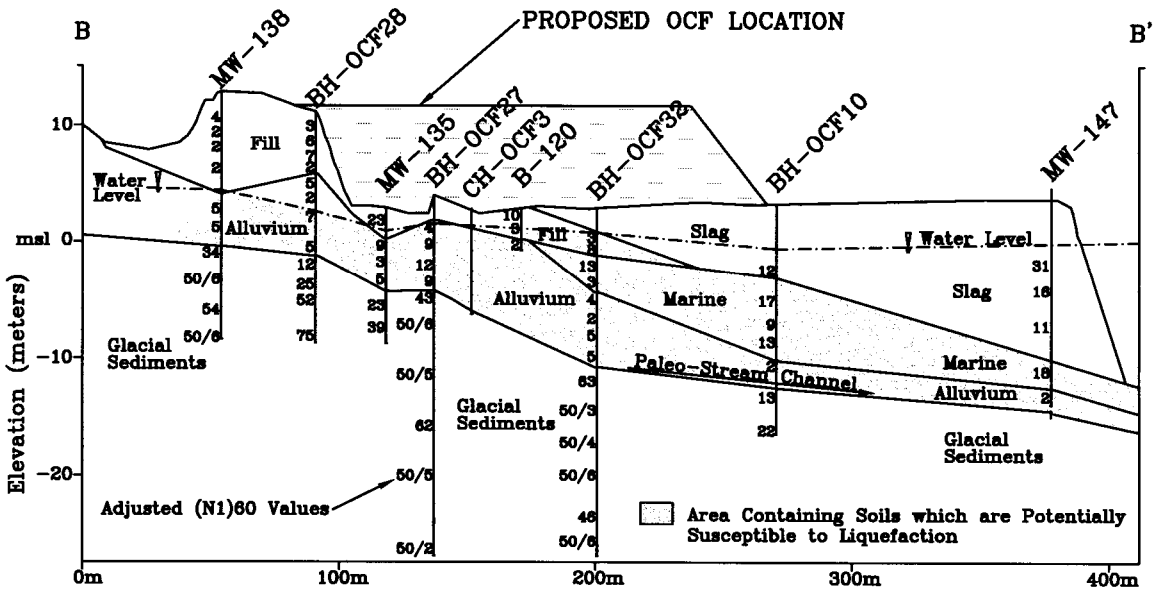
Cooling Pond Drainage Longitudinal Profile (Cross Section B-B')
